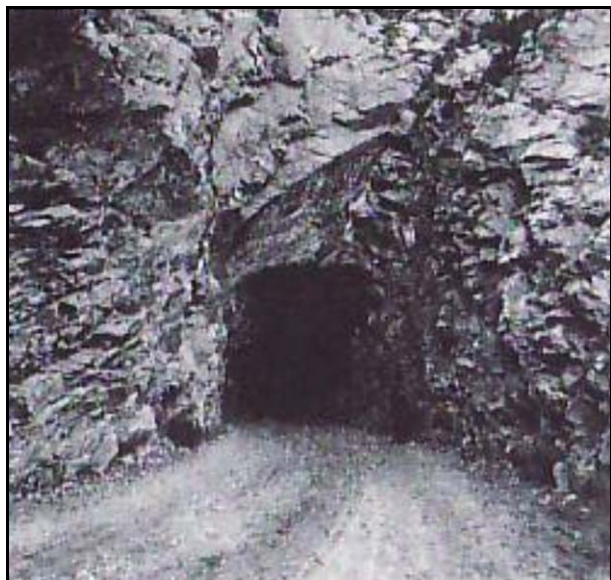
View into Bain’s original tunnel from the Montagu side (Source: Montagu Archives³).
